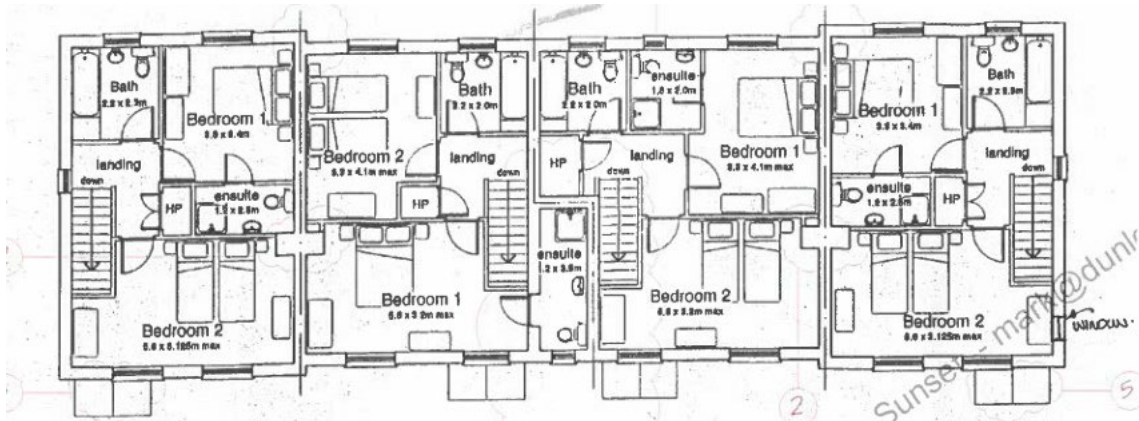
Previously Approved First Floor Plans under W/2003/1085/F
